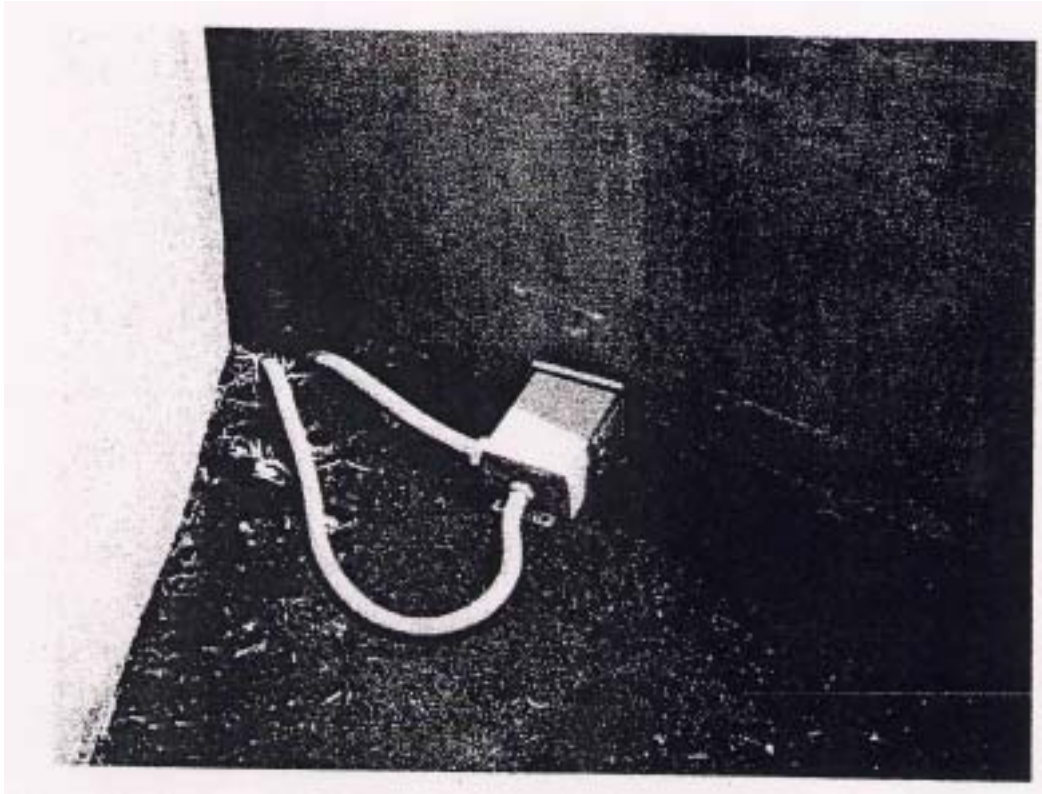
Conduits and Enclosure – Wyckoff Road Westbound
